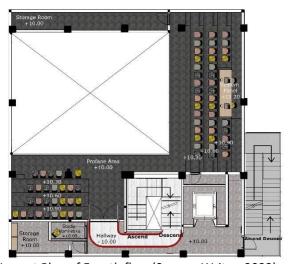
Layout Plan of Fourth floor(Source: Writer, 2023)
